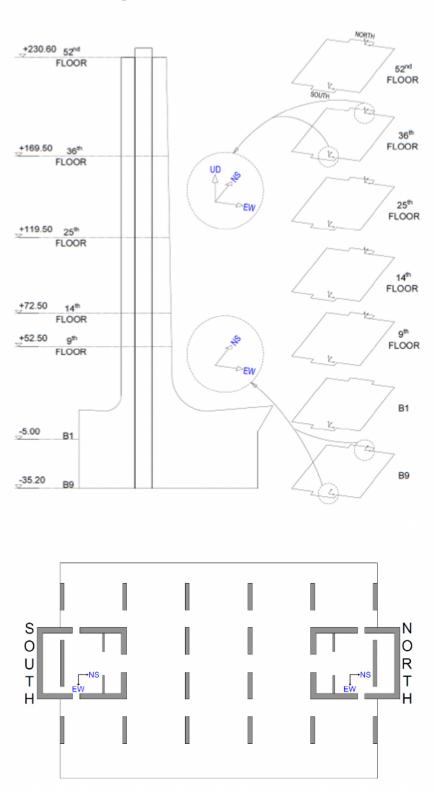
Location of the sensors in the Sapphire building (vertical elevation and plan view).
